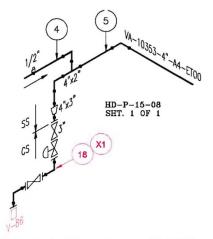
A partial view of isometric drawing HD-P-15-08, sheet 1 of 1. The tie-in to V-86 and location of profile radiography (X1) are shown in red.
